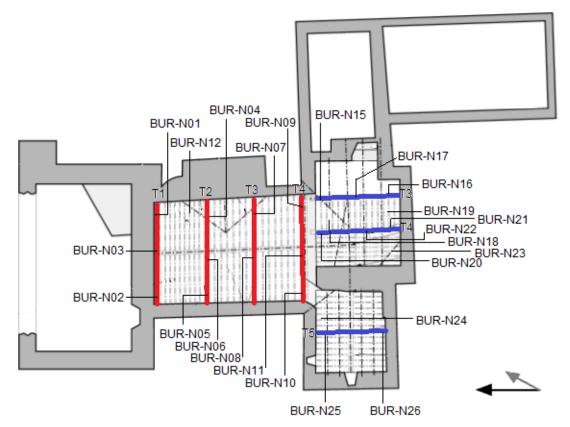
Roof level plan showing the location of the sampled timbers, samples BUR-N01-BUR-N12 and BUR-N15-BUR-N26
